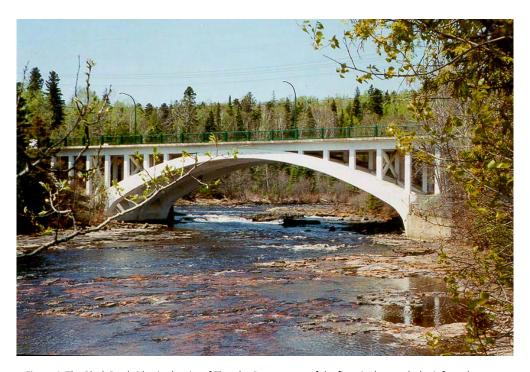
The Black Bay bridge in the city of Thunder Bay was one of the first single spandrel reinforced concrete bridges ever constructed (MHSTCI).
